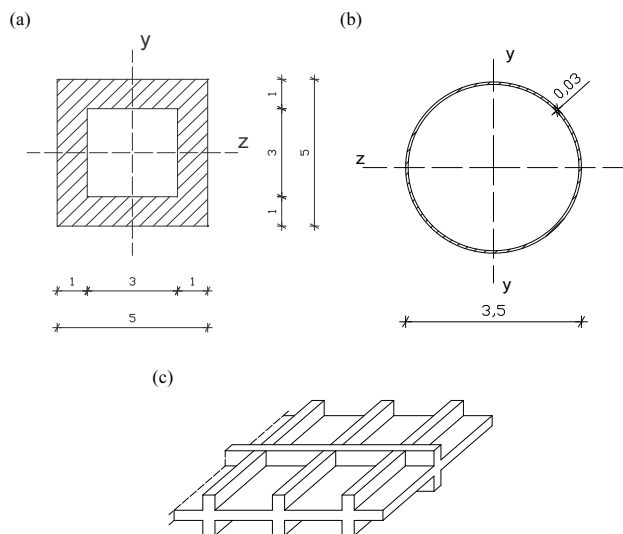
(a) Pylon's cross-section, (b) Arch's cross-section, (c) Plate model
